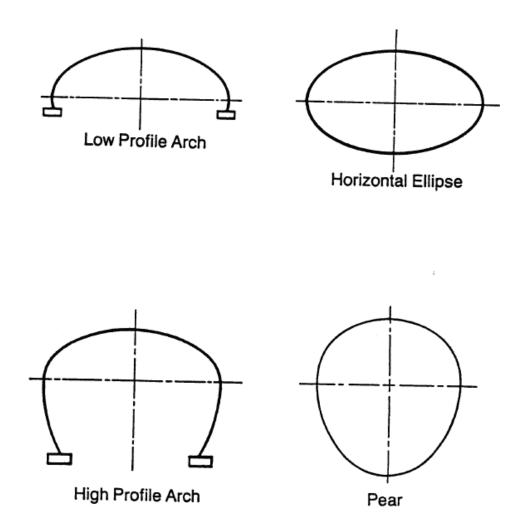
(Exhibit 93) Typical Long-Span Shapes
